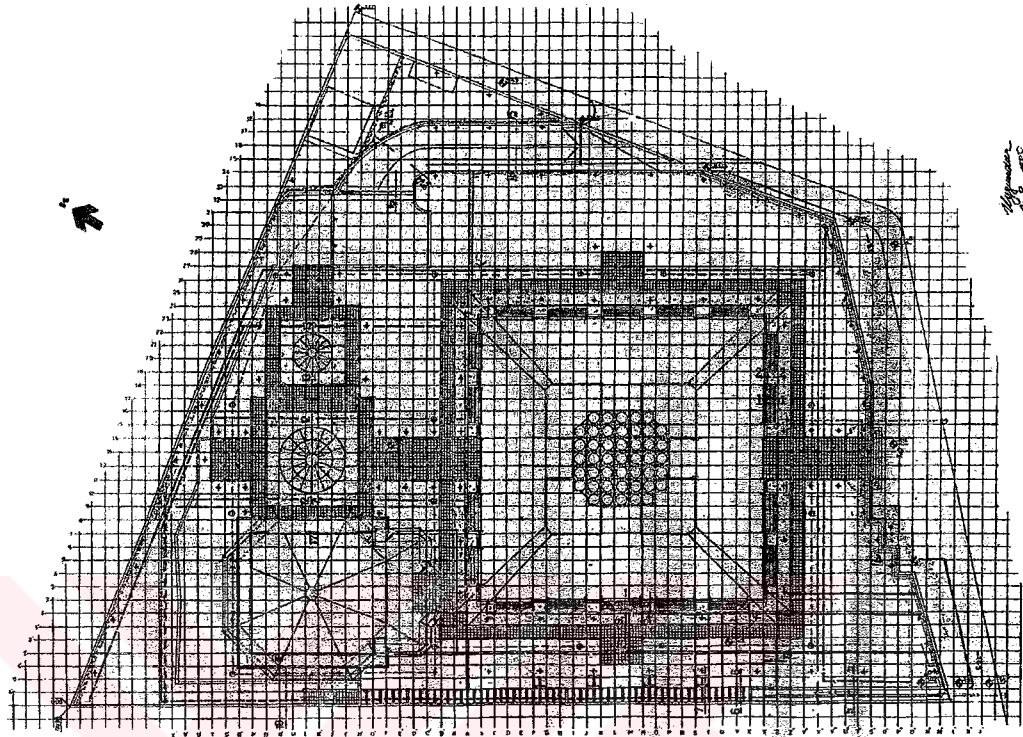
Şark Insurance Company Headquarters –site plan.
